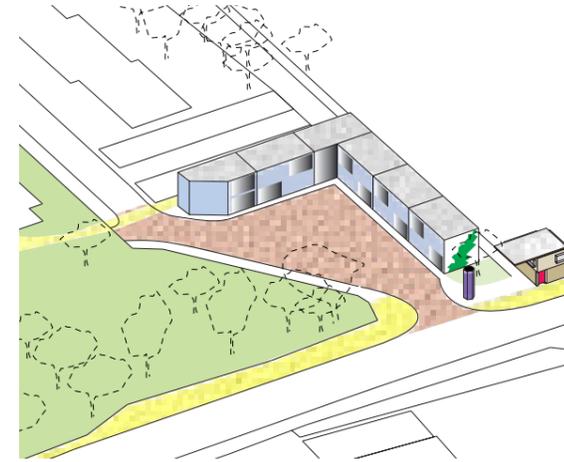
Gridiron Place: new startup business units incorporating a youth club: note "gateway" building forming Upminster Park entry with an artwork located opposite
